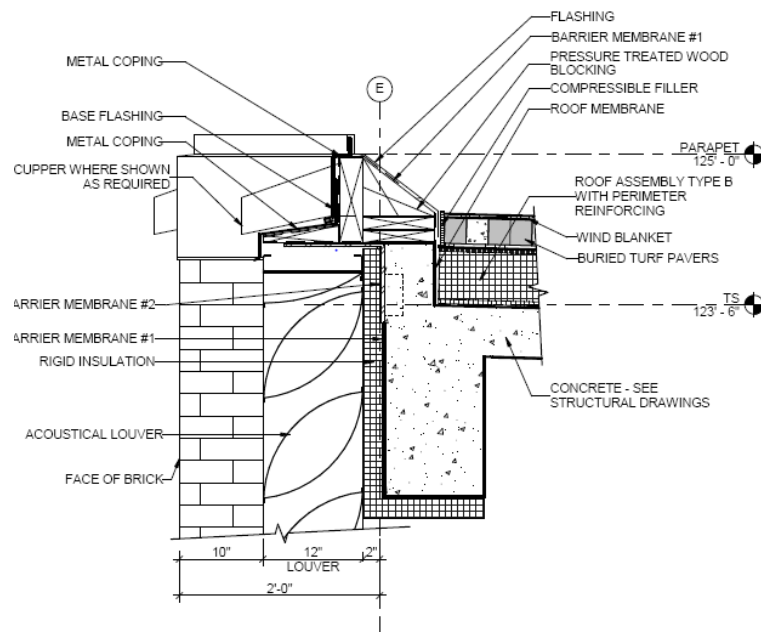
Detail of Roof Above Column C7 (image provided by HDR, Inc.)
